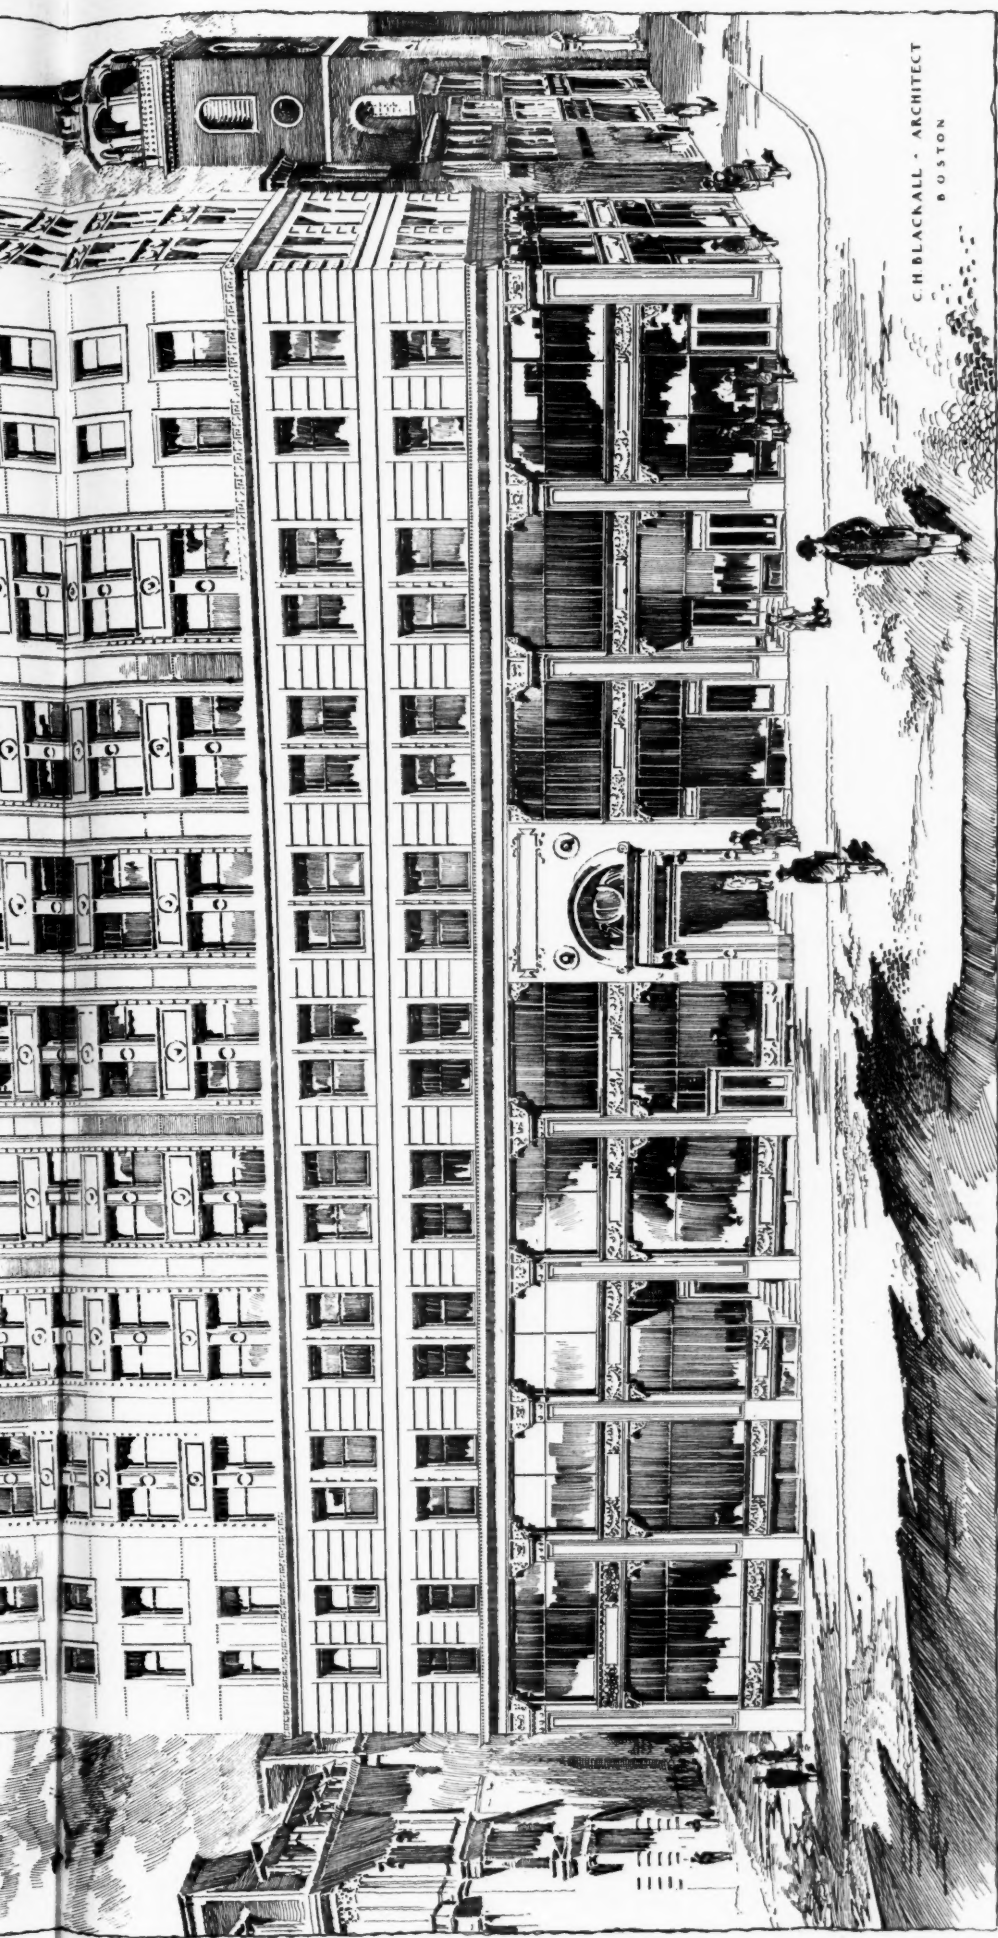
DETAILS OF OFFICE BUILDING, CORNER WASHINGTON AND WATER STREETS, BOSTON.
